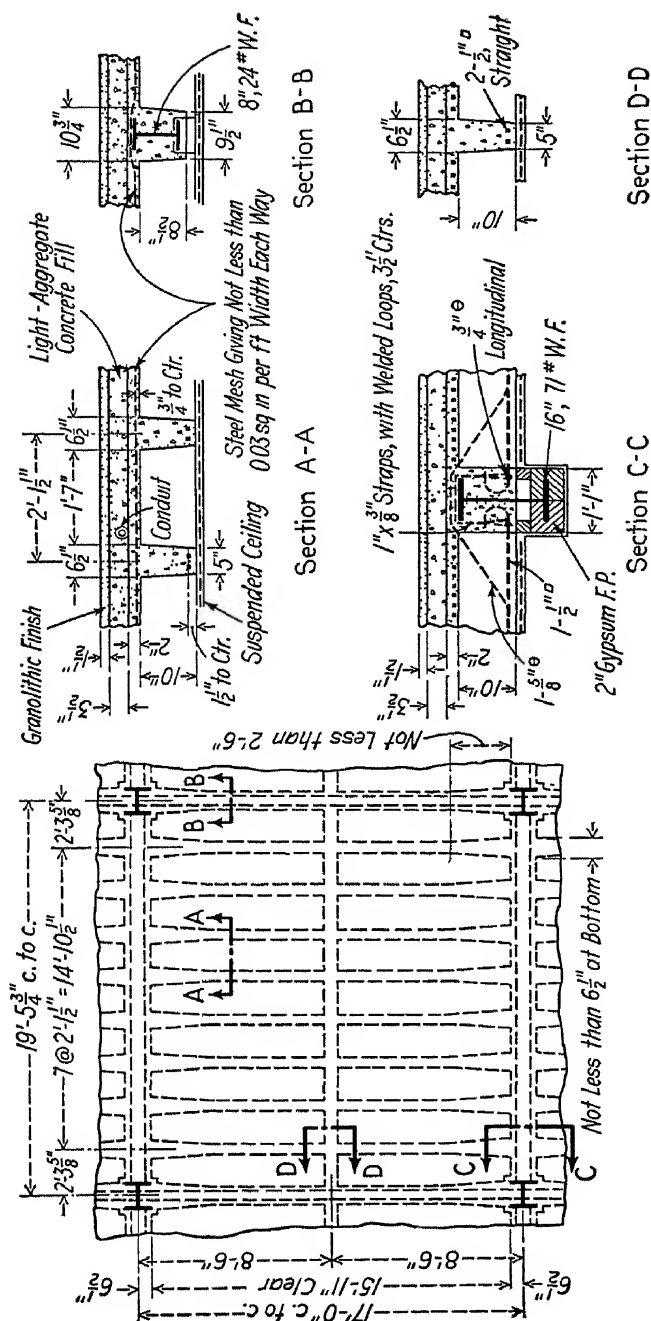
Interior Floor Panel with Concrete Joints and Steel Girders.
